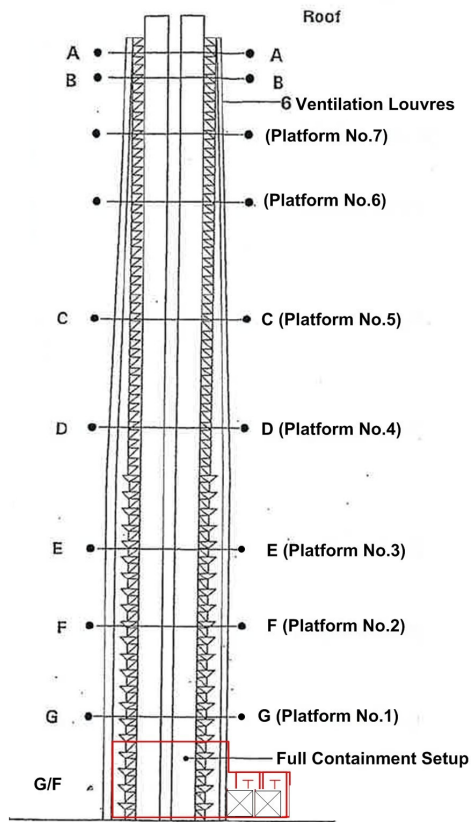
Layout Plan of Asbestos Abatement Work in Chimney - ACM Ventilation Louvres
